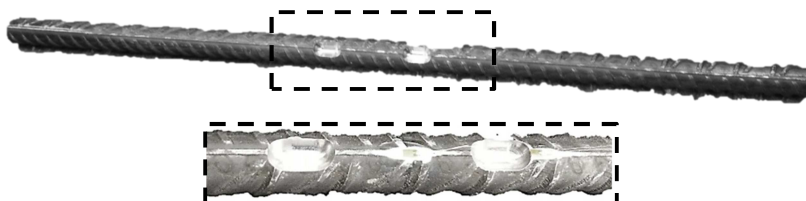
Example of two local damages created in a reinforcing bar
